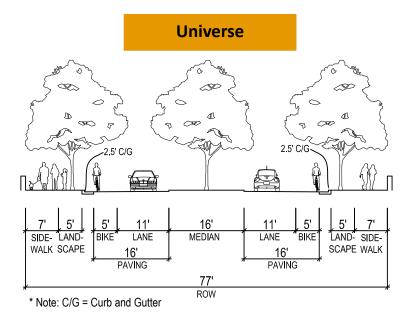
Street Type 8: Universe Boulevard Cross Section
